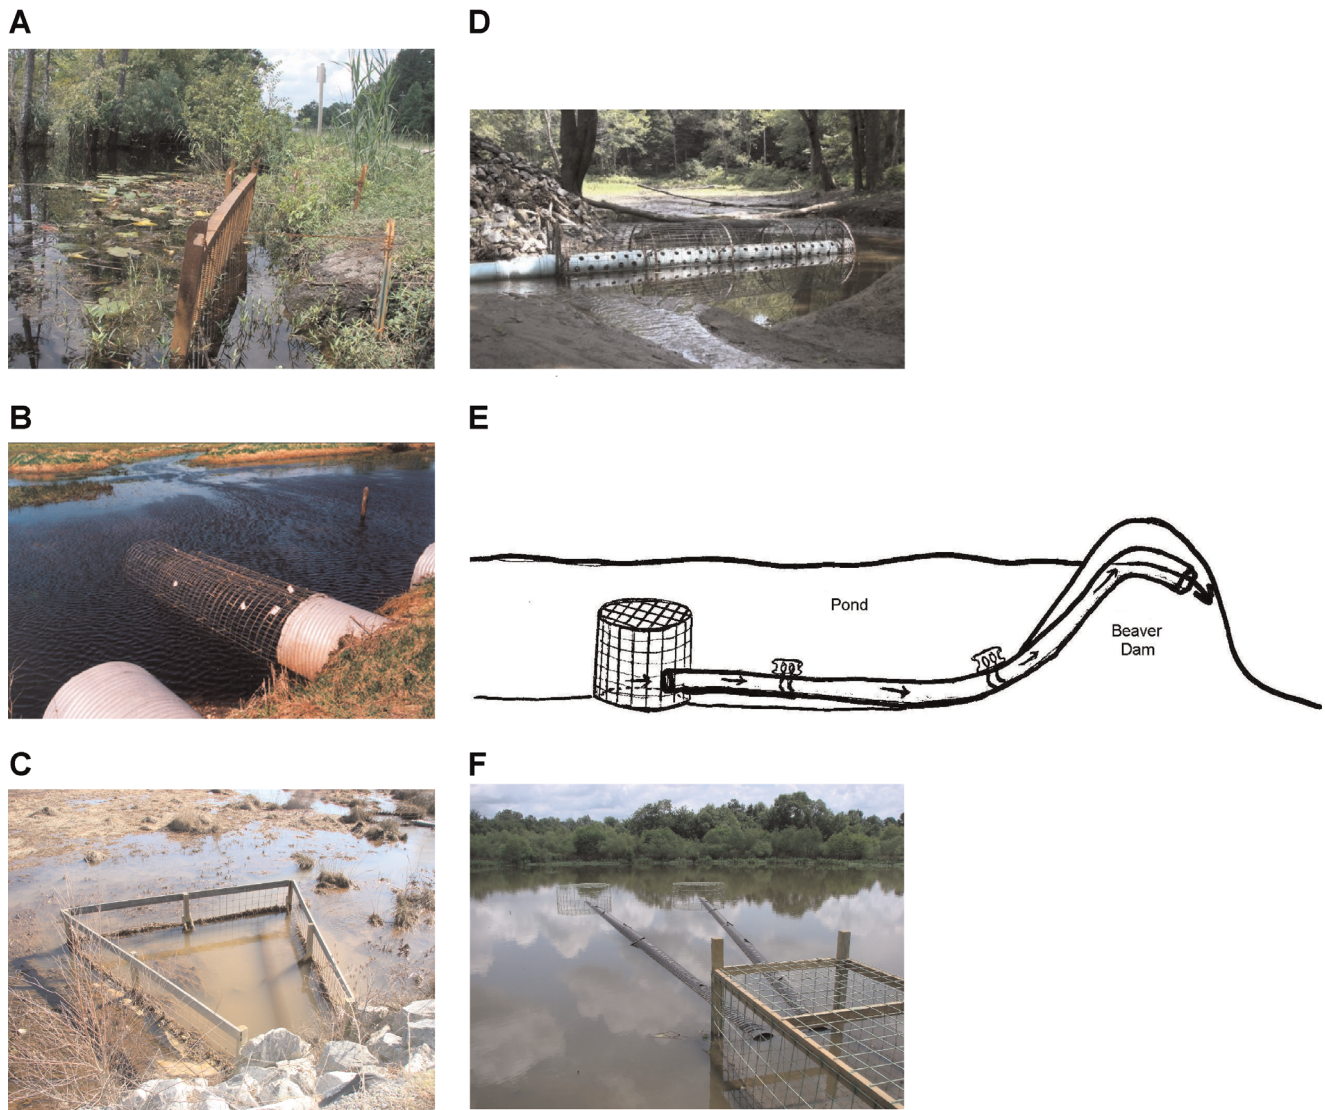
Examples of non-lethal devices used to reduce flooding by beavers. (A) A culvert guard in North Carolina, USA. Photo credit—National Wildlife Research Center. (B) A culvert extension. Photo credit—canadaculvert.com. (C) A trapezoidal beaver fence (in this case a Beaver Deceiver™) located in Virginia, USA. Photo credit—National Wildlife Research Center. (D) A Clemson pond leveler. Photo credit—martinezbeavers.org. (E) Drawing of a Flexible Pond Leveler™ provided by M. Callahan, demonstrating the exclusion at the intake, the distance separating intake and exit from the pipe, and maintenance of preferred water level by the “hump” in the pipe going through the dam. (F) A double pipe system located in Virginia, USA, demonstrating the use of culvert fencing (lower right corner), flexible pipe, and round fencing. Photo credit—National Wildlife Research Center.
